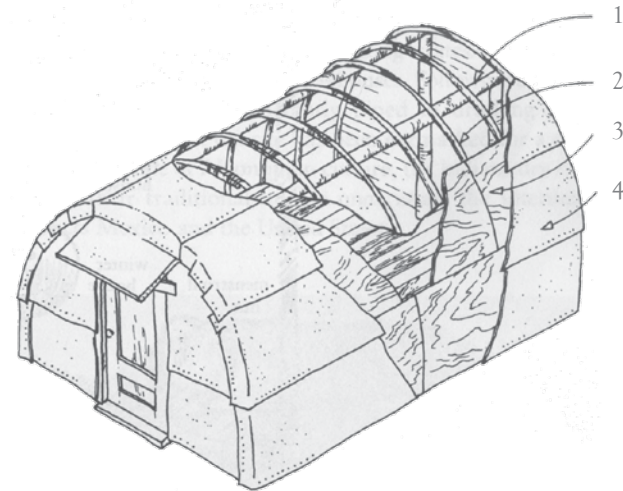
Modern wigwam material adaptation documented in 1910. Floor plan: 12 feet by 16 feet long. Structure: 2 to 3 inch poles are bent over two larger horizontal poles supported by two larger posts (8 to 10 feet high) at each end. If a concrete floor is used, poles can be set in cut pop bottles that are set in the wet concrete. Windows set vertically with a small overhang similar to door. (1) Horizontal poles on posts. (2) Tamarack poles. (3) 1/8 inch plywood over 1/4 inch boards. (4) Mineral surfaced tarpaper.
